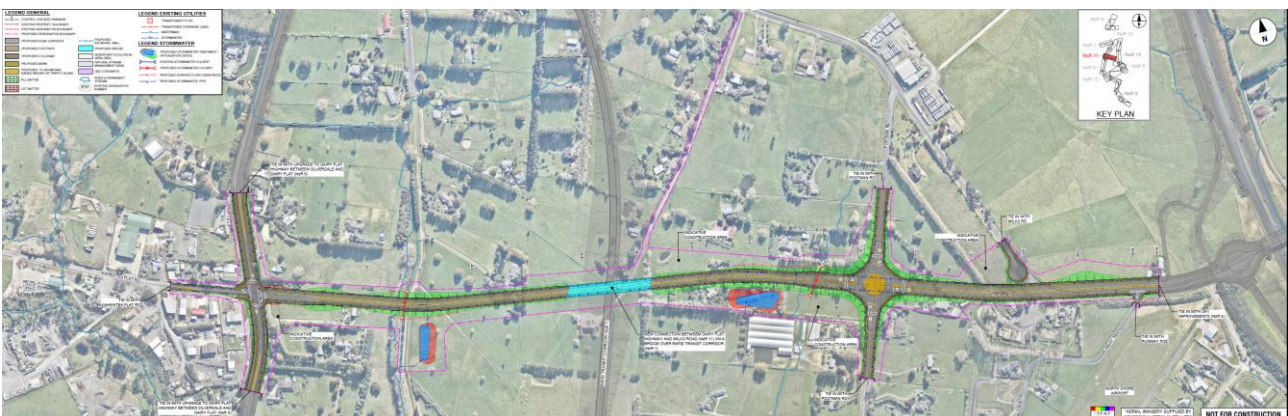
NoR 11 location and extent (sourced from the General Arrangement Plan)
